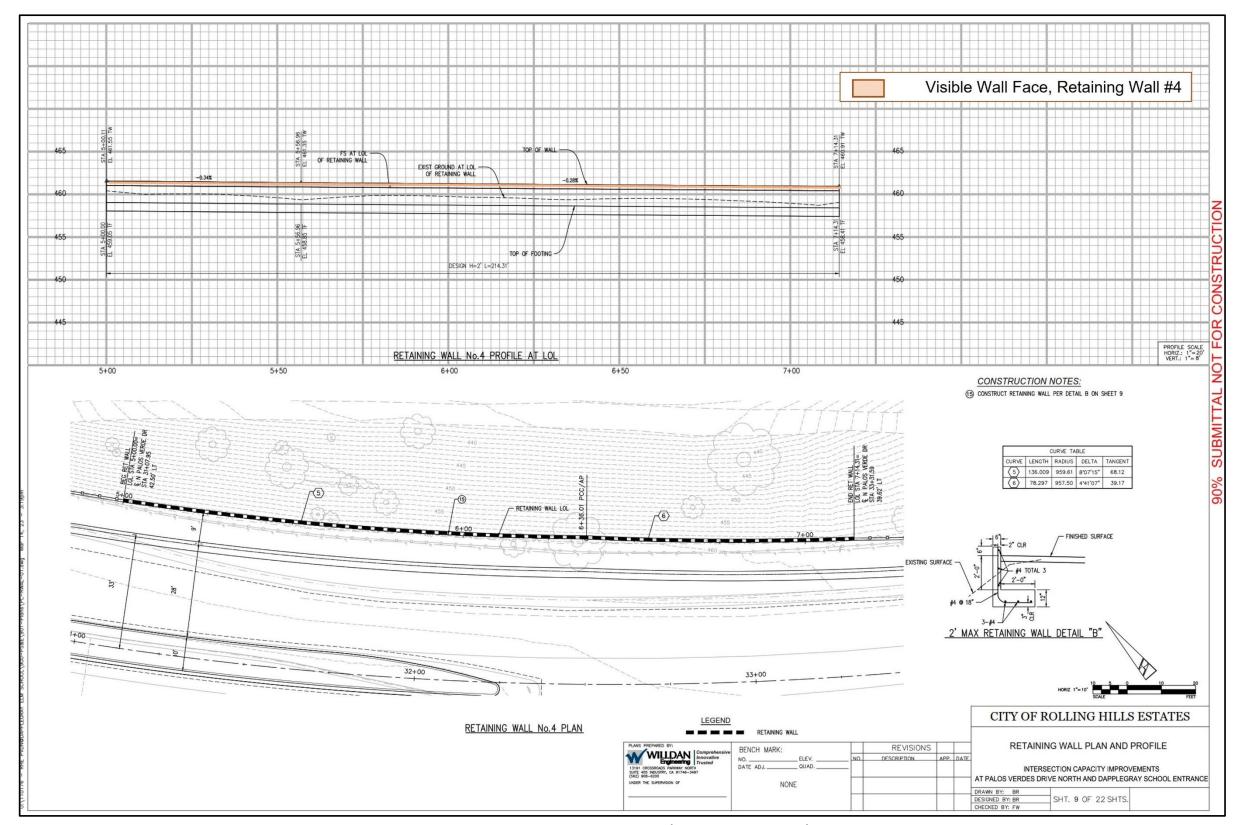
Retaining Wall No. 4 (Schematic Illustration)
